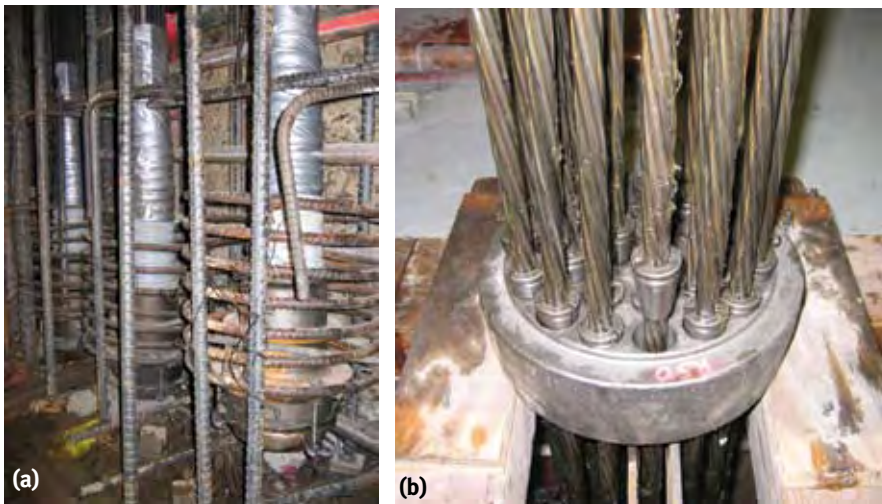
Anchors for bundled tendons in the shearwalls: (a) fixed (dead) end anchors in the basement surrounded by spiral reinforcement to resist bursting stresses; and (b) fixed (live) end anchor at the roof level
